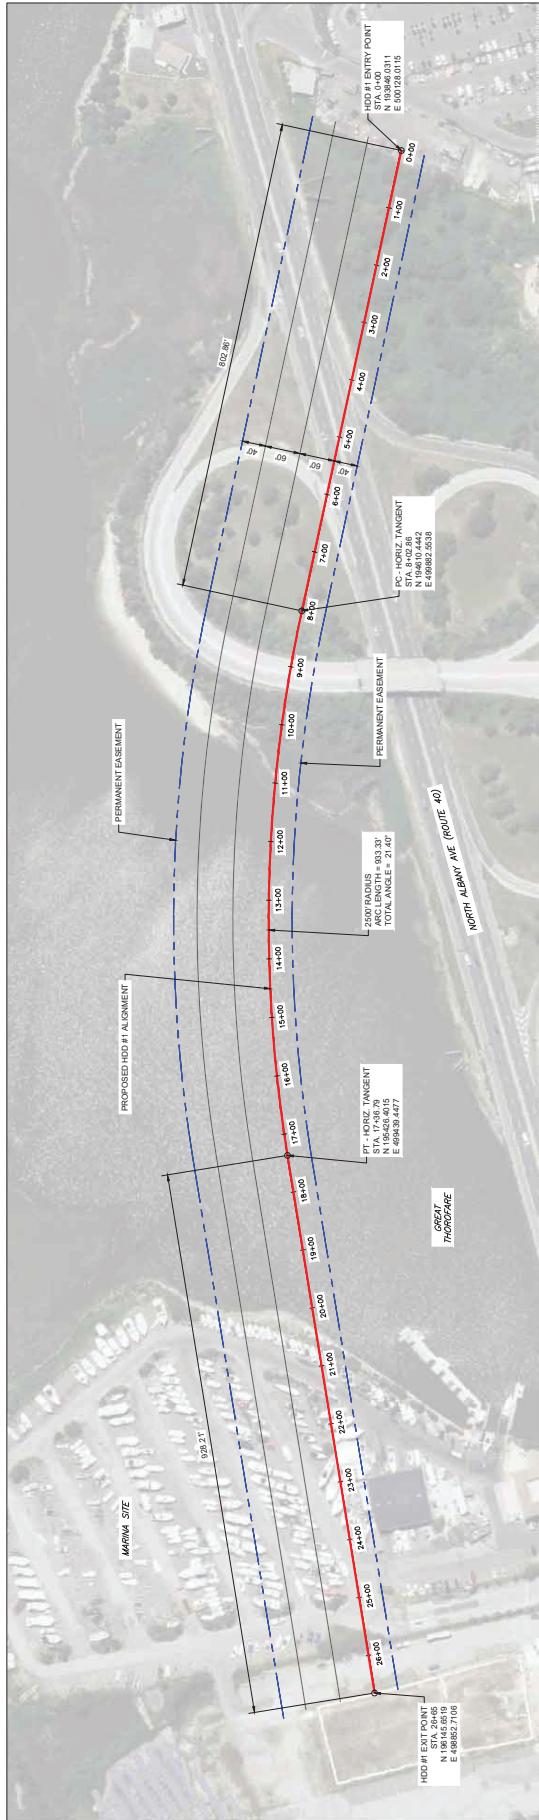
Great Thorofare Crossing #3 HDD Plan & Profile
